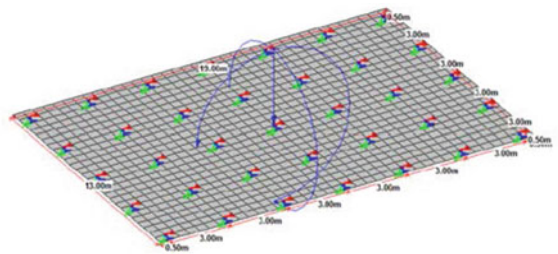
Geometric details of rectangular pile and pile cap arrangement with central pile
